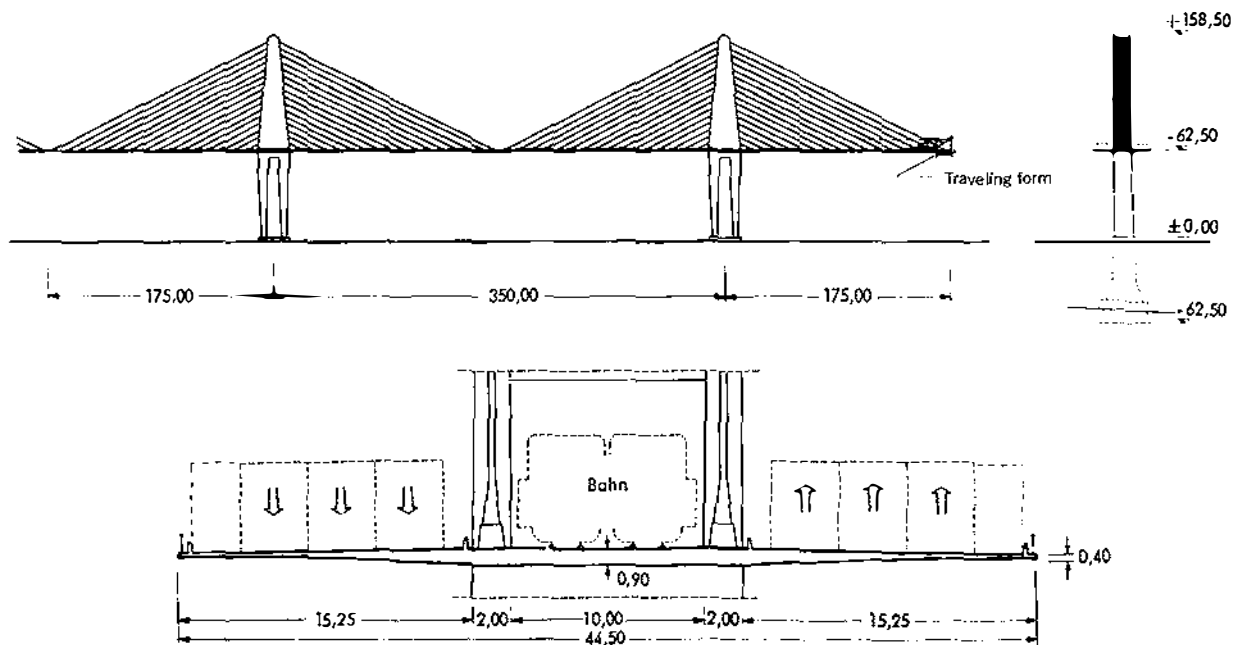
Danish Great Belt Bridge, elevation and cross section. (Courtesy of Dyckerhoff & Widmann.)
